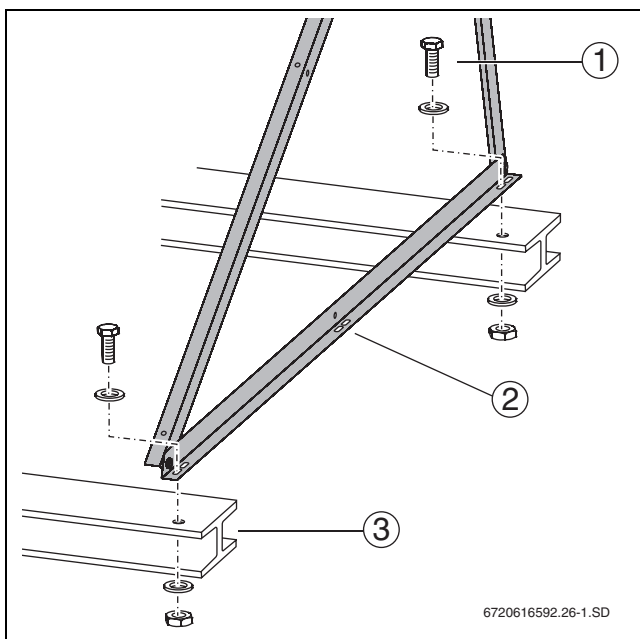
Installation, e.g. on I-beams (provided on-site)
